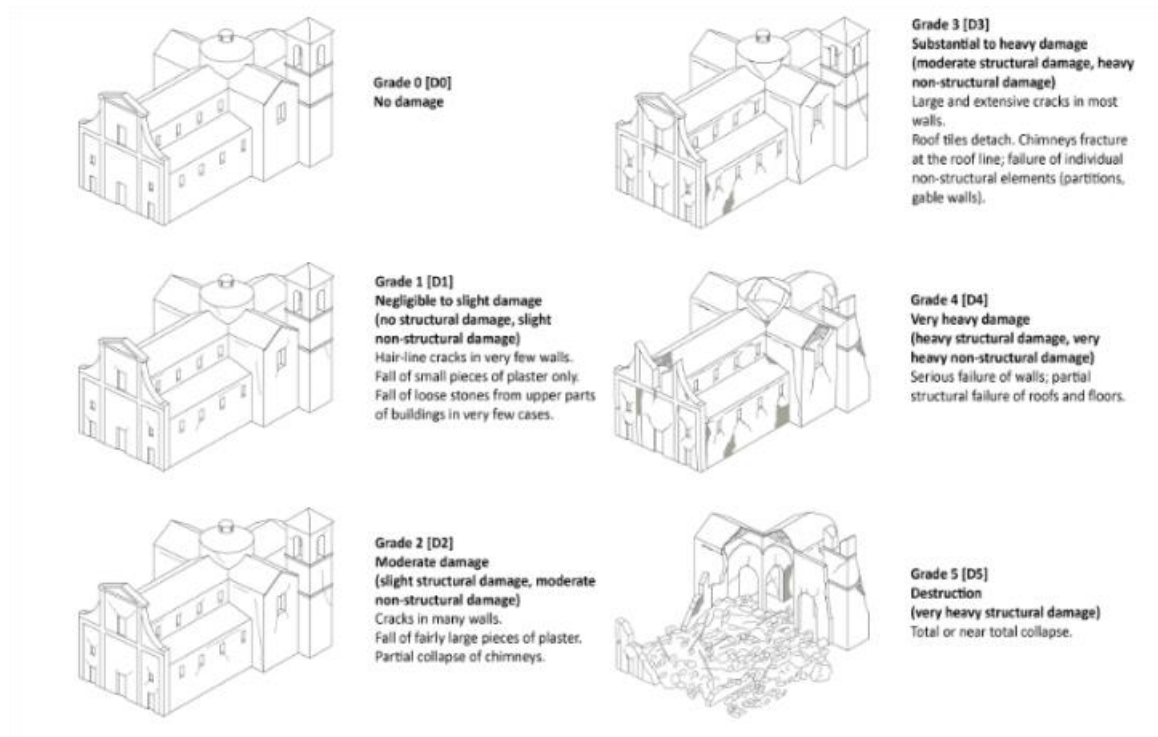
EMS-98 damage scale adapted to churches [13]
